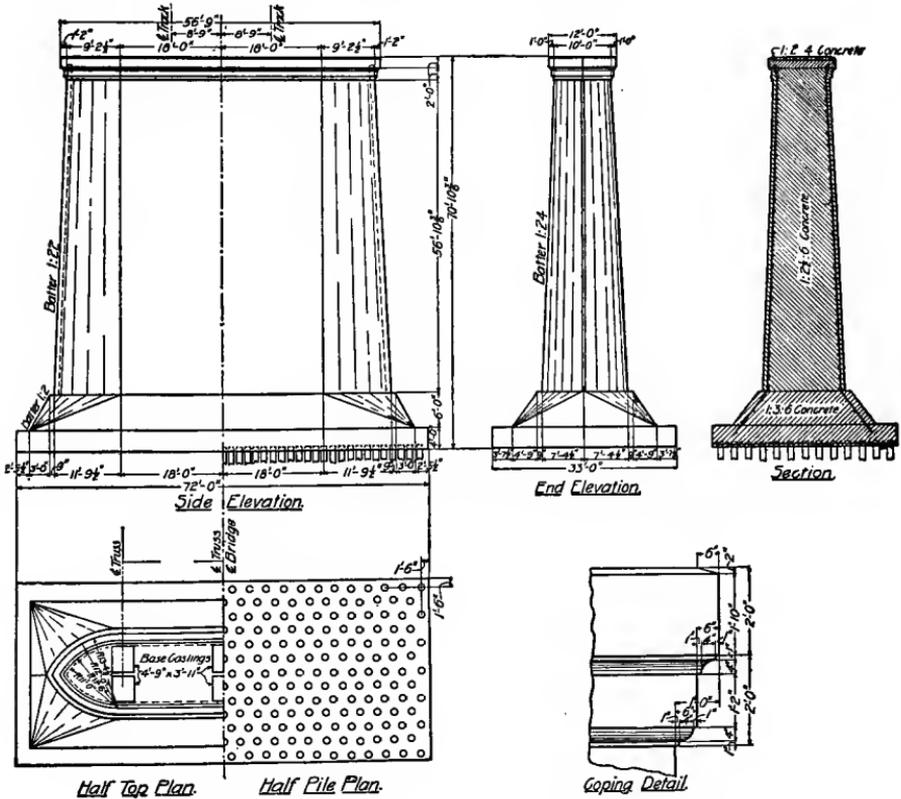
PIER TENNESSEE RIVER BRIDGE. ILLINOIS CENTRAL R.R.
